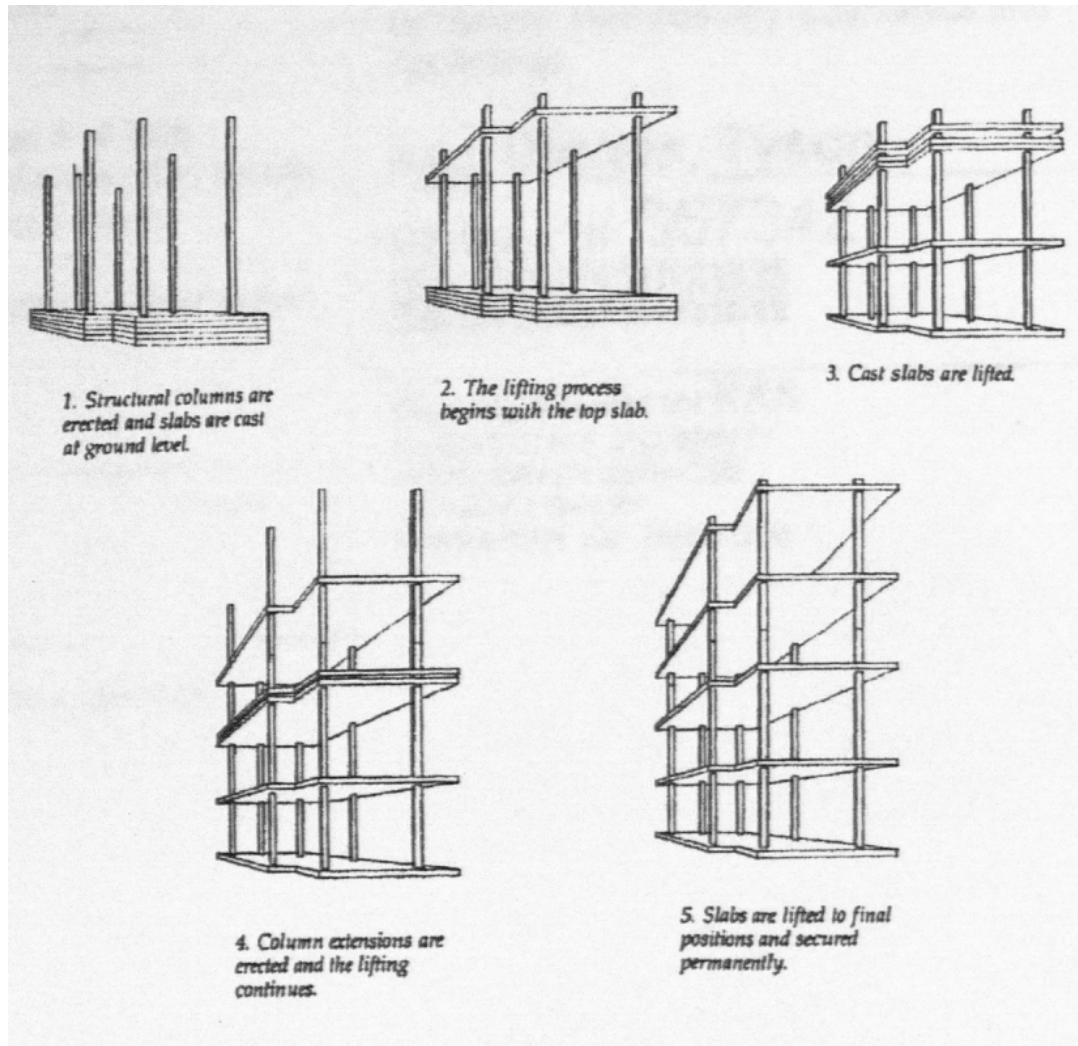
Typical lift slab lifting sequence (Russillo 1988)
